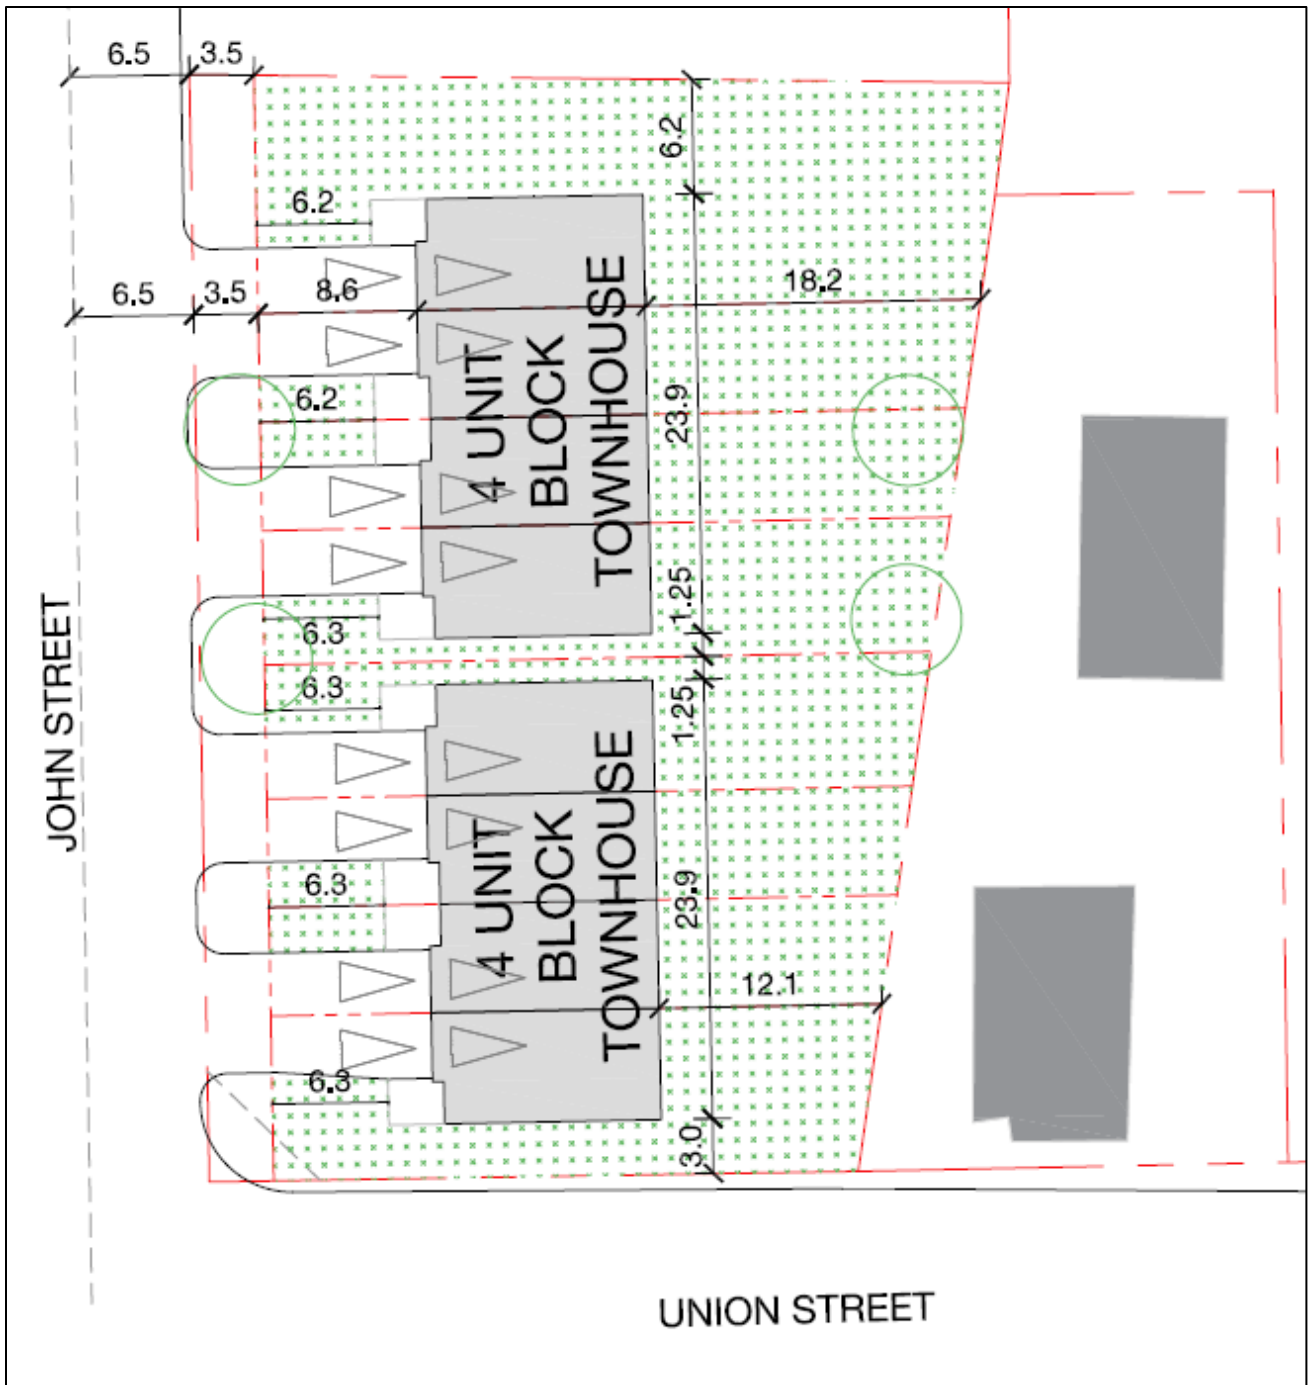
Concept Plan (Source: Fotenn Planning + Design)
